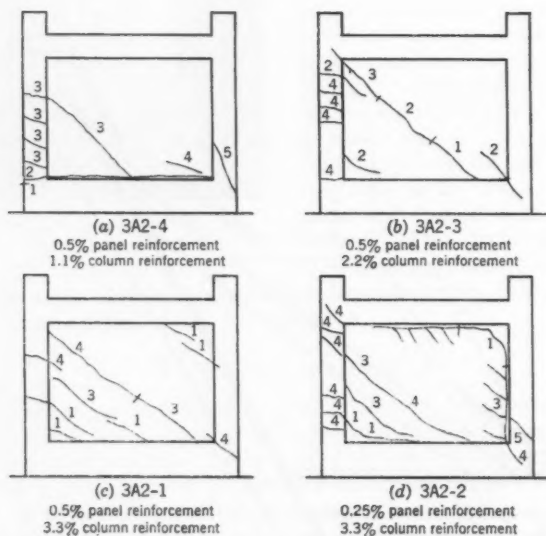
CRACKING PATTERNS FOR REINFORCED WALL PANELS WITH VARIED PERCENTAGES OF STEEL IN THE COLUMNS (LOAD APPLIED AT UPPER LEFT CORNER)
